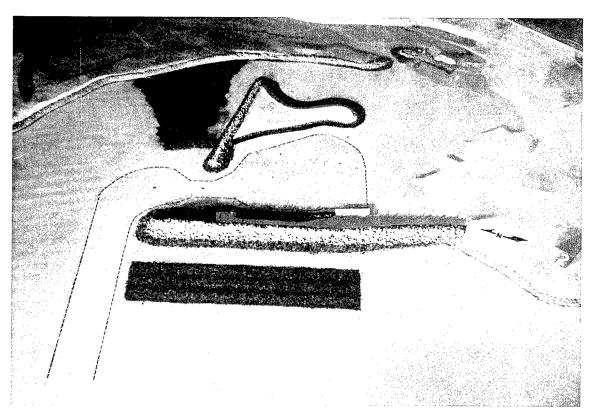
Placement of tracer material for Plan 12 prior to model testing
